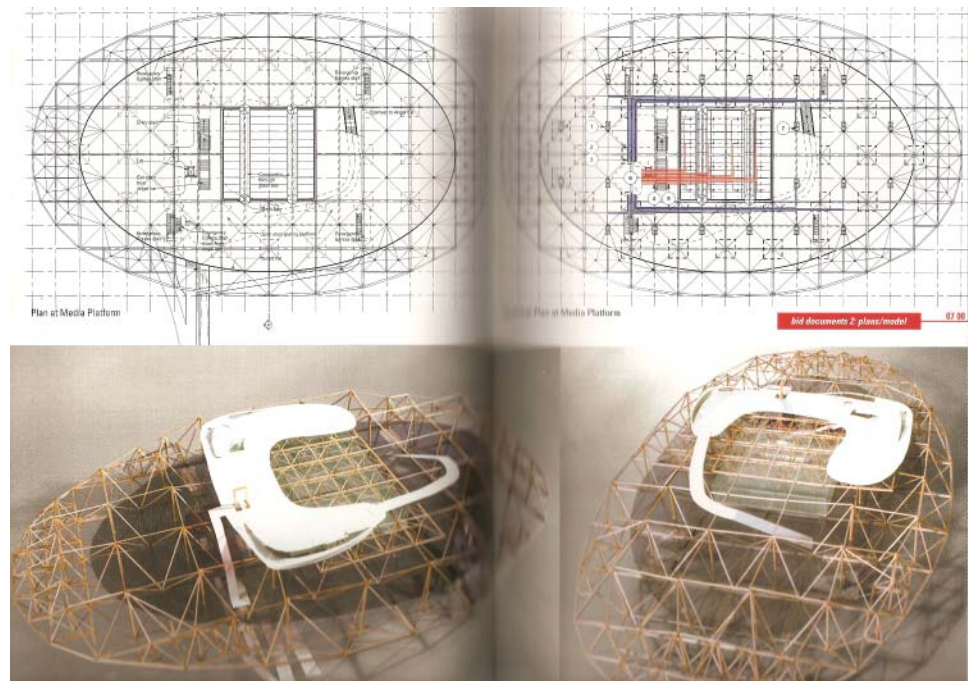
Blur Building - Floor Plan and Model Images
